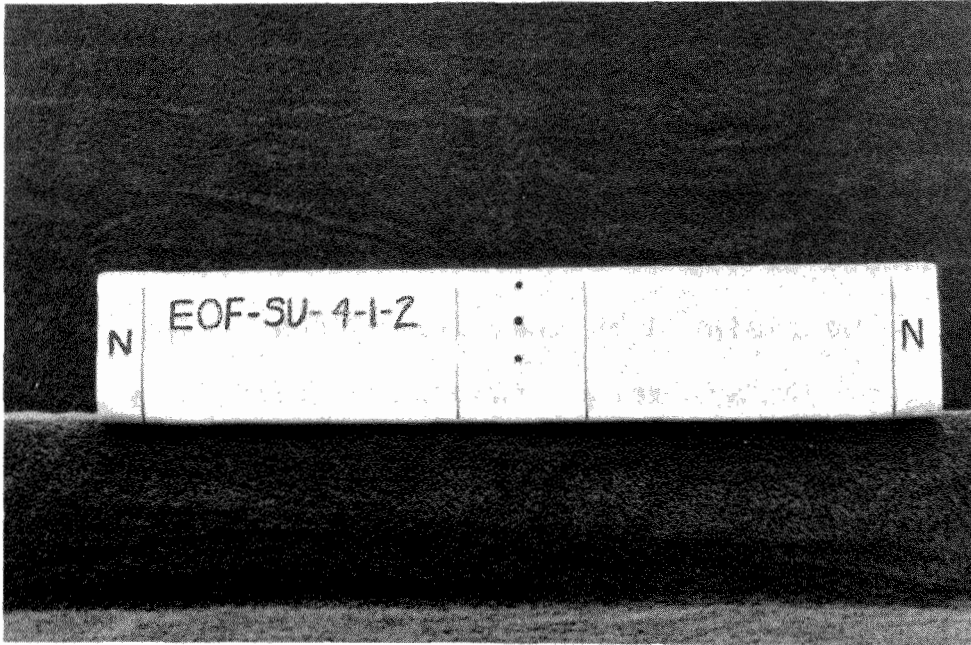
Typical Unreinforced EOF Solid Web Crippling Failure, EOF-SU-4-1-2
